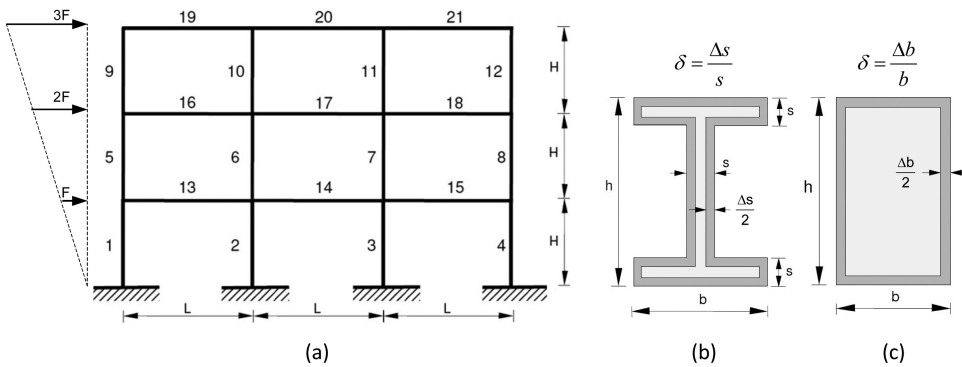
Frame system under damage (adapted from Biondini & Restelli 2008). (a) Geometry ($L/H = 2$), structural scheme, and loading. Cross-sections of (b) beams ($h/s = 15$) and (c) columns ($h/b = 1.5$).
